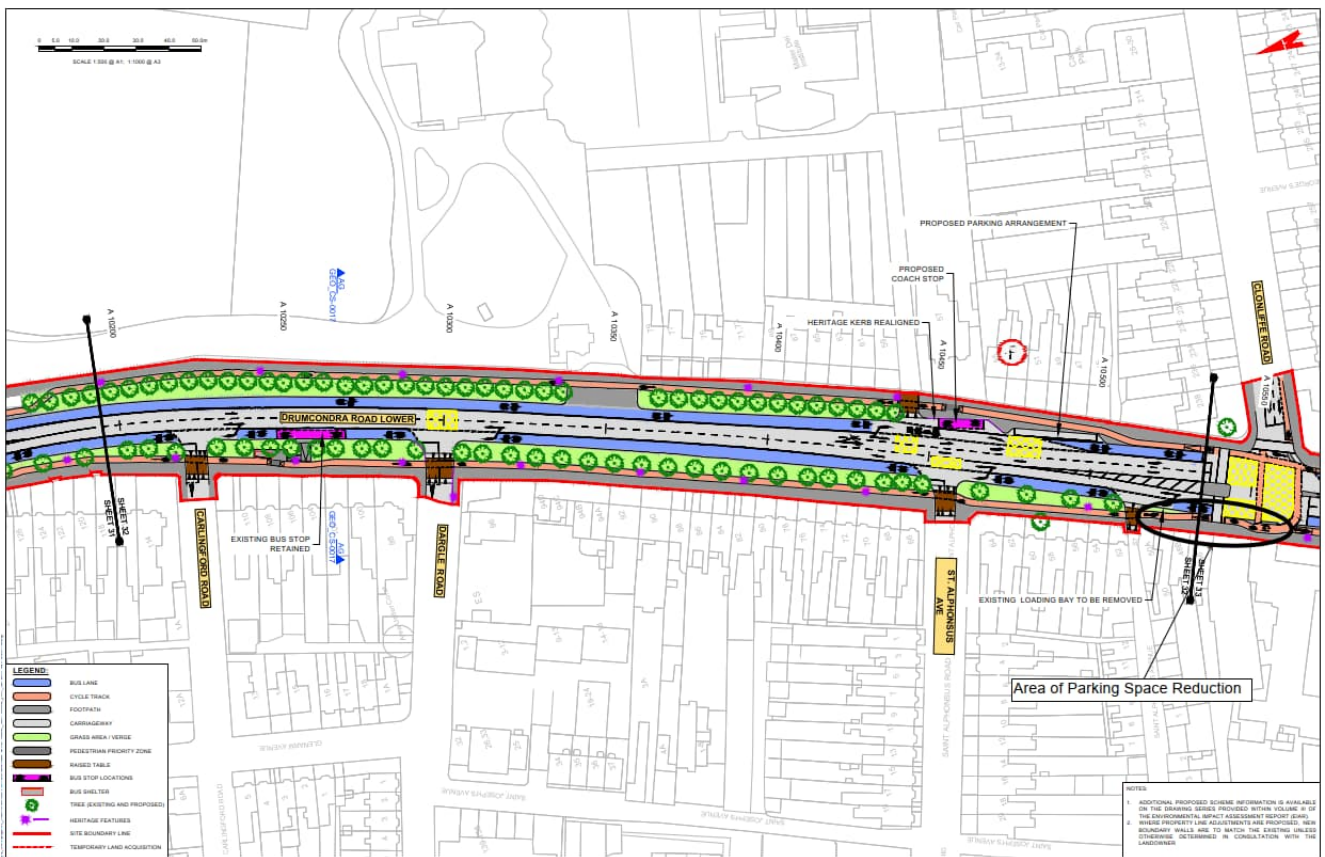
Commercial Parking Impact – Lower Drumcondra Road / Alphonsus Avenue to Whitworth Road
